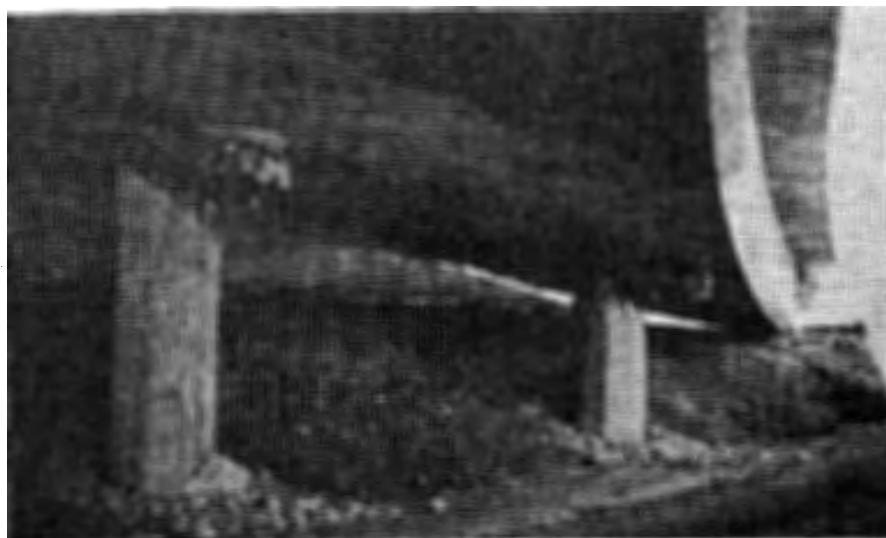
Northwest Connector Overcrossing bridge. Bent 2 column. Note severe crushing of concrete at tops of columns as well as displacement due to superstructure rotation. California Division of Highways, Bridge Department photograph.
